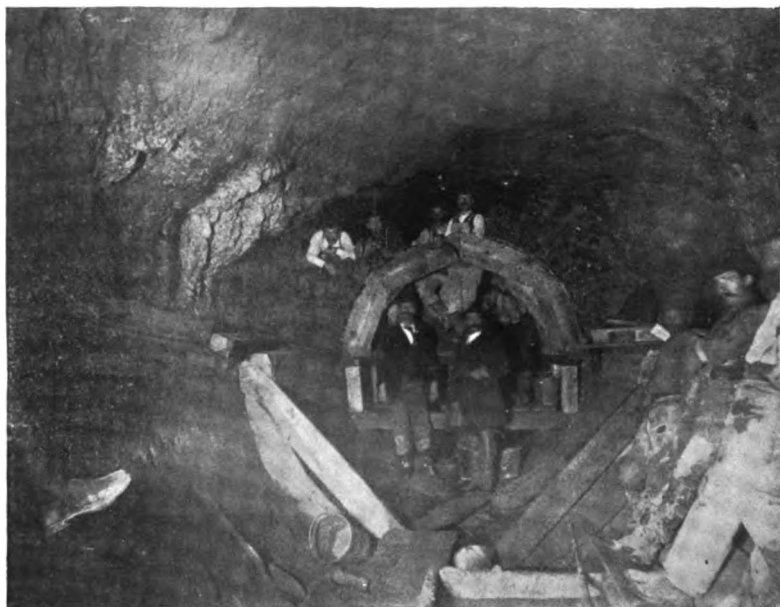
TUNNEL ON PENNSYLVANIA AVENUE, WEST OF 26TH STREET.
